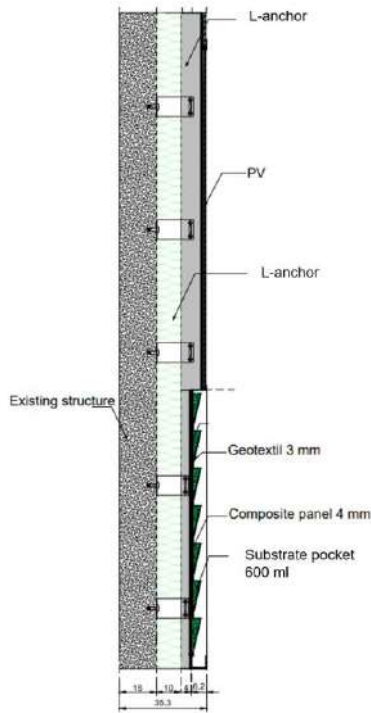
Cross-section of façade elements – Design Proposal (Pich Aguilera Arquitectos S.L.).
